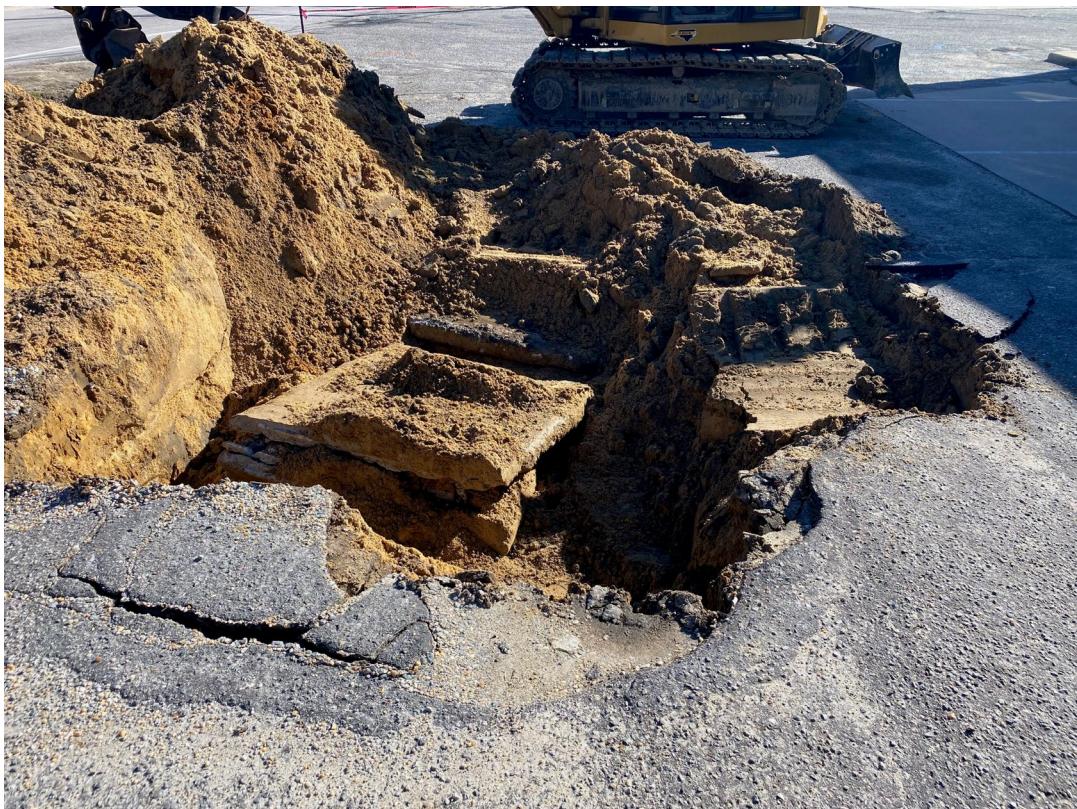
View of the concrete debris and stockpiled excavated material placed back in the excavation.
